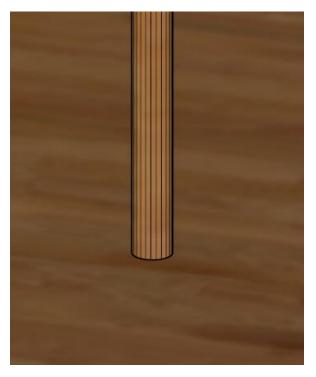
3D sketch showing insertion of a wooden pillar in the hole
